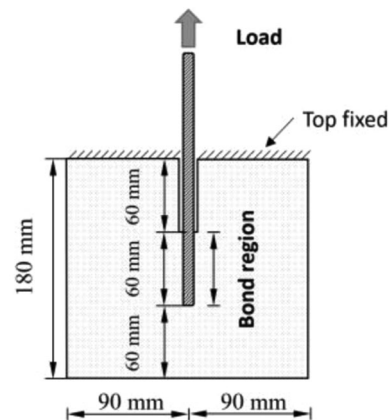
Details of embedded reinforcement and constraint condition for the one-end pull-out test of reinforcement in concrete
